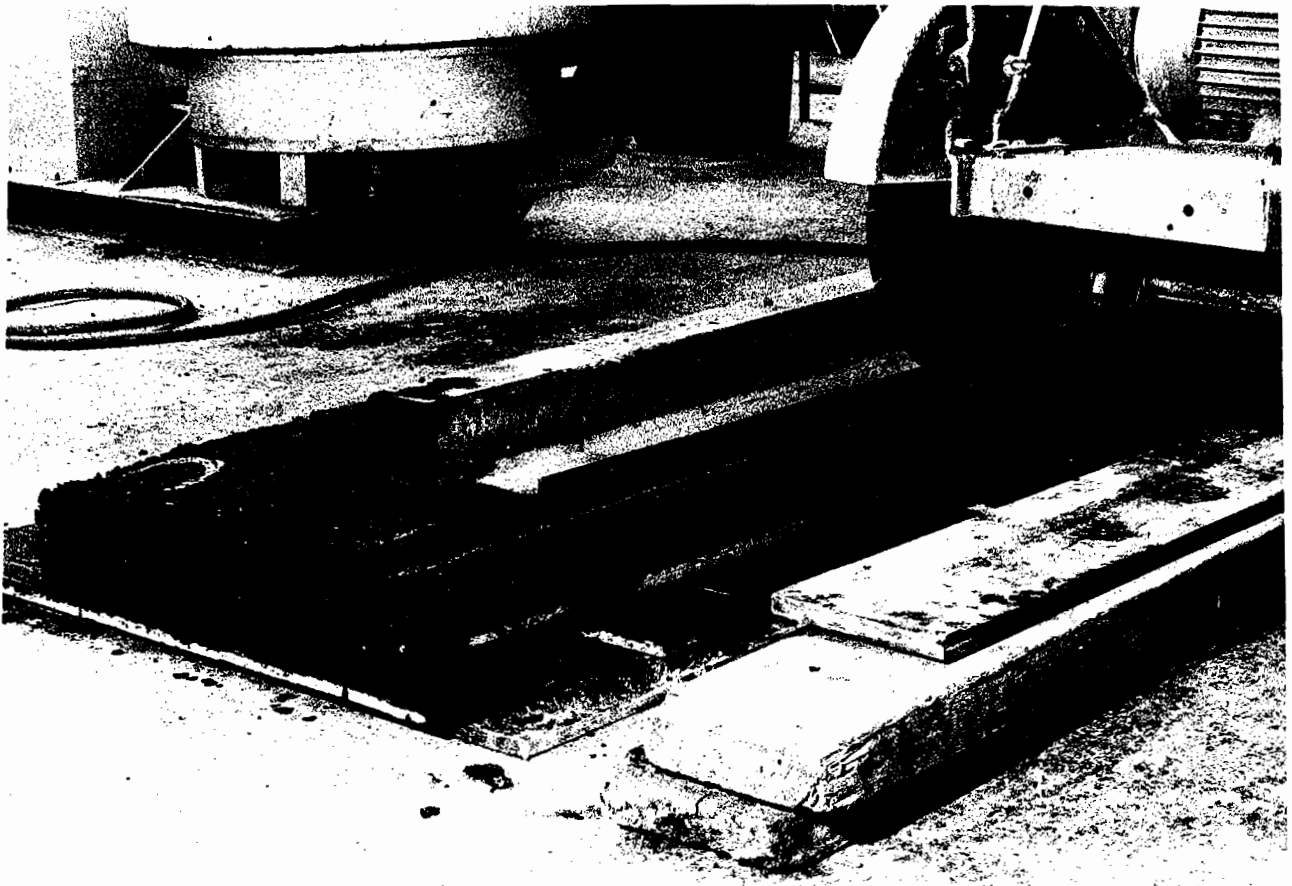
(a) One Face of the Slab Was Sawn to Better Facilitate the Viewing of Crack Propagation
